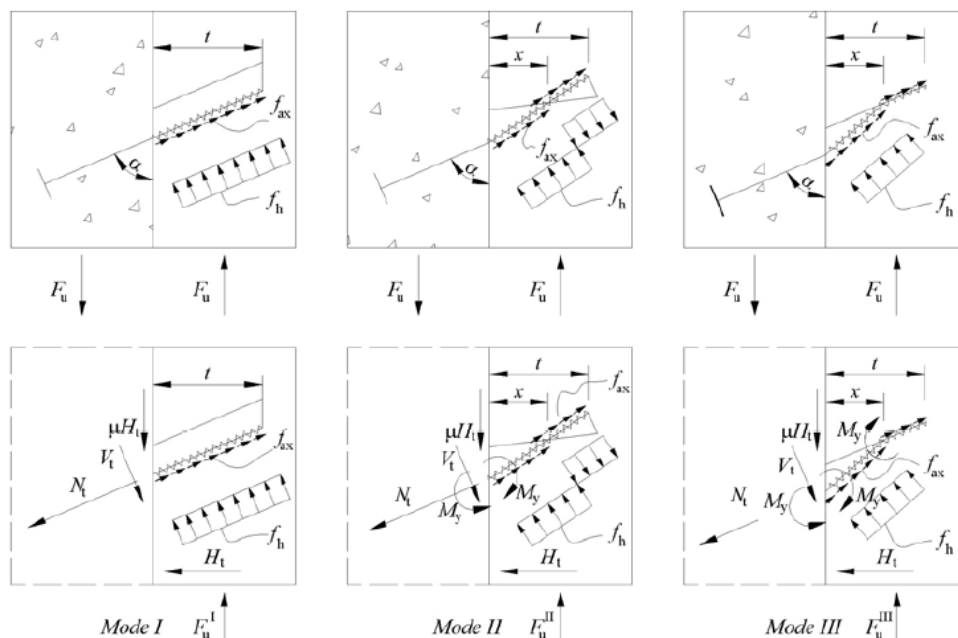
Stresses in a timber-to-concrete or steel-to-concrete connection with an inclined screw for three Johansen's failure modes [12].
